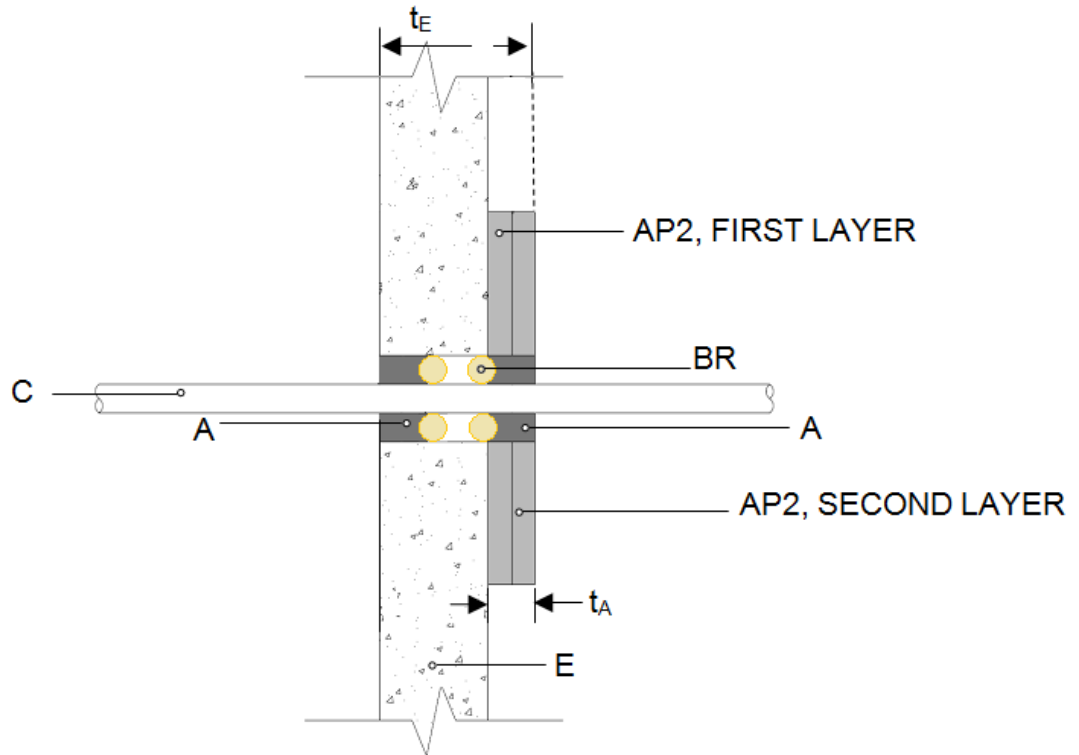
(b) - Details for PE-X Pipes in 75mm rigid wall with additional protection 2 × AP2 (one side only)
